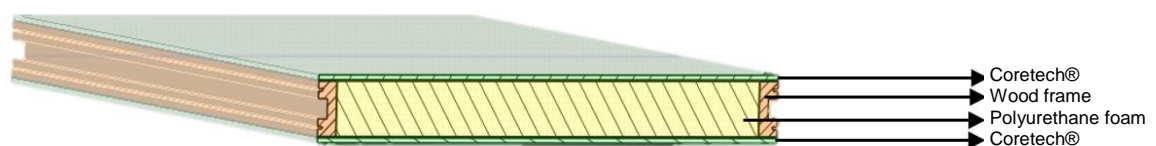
MORE-CONNECT prefabricated element for façade renovation
